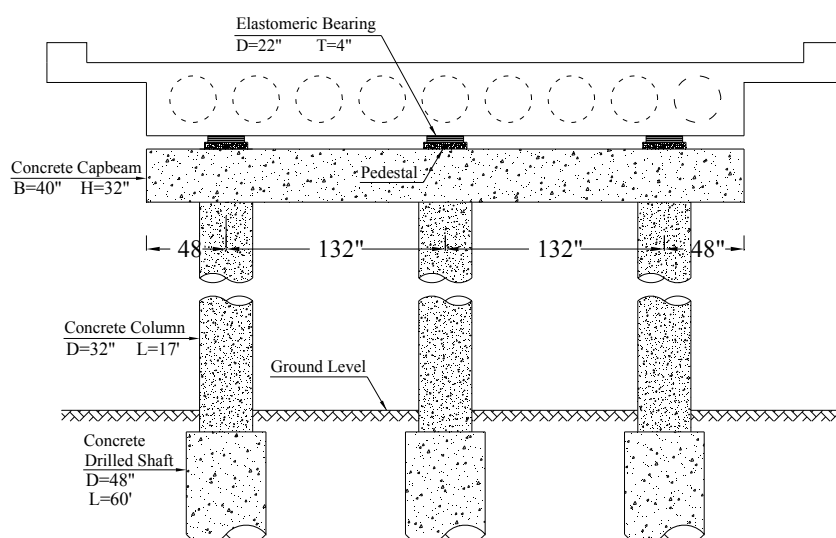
Bearing-Isolated Connection of Piers and Superstructure
